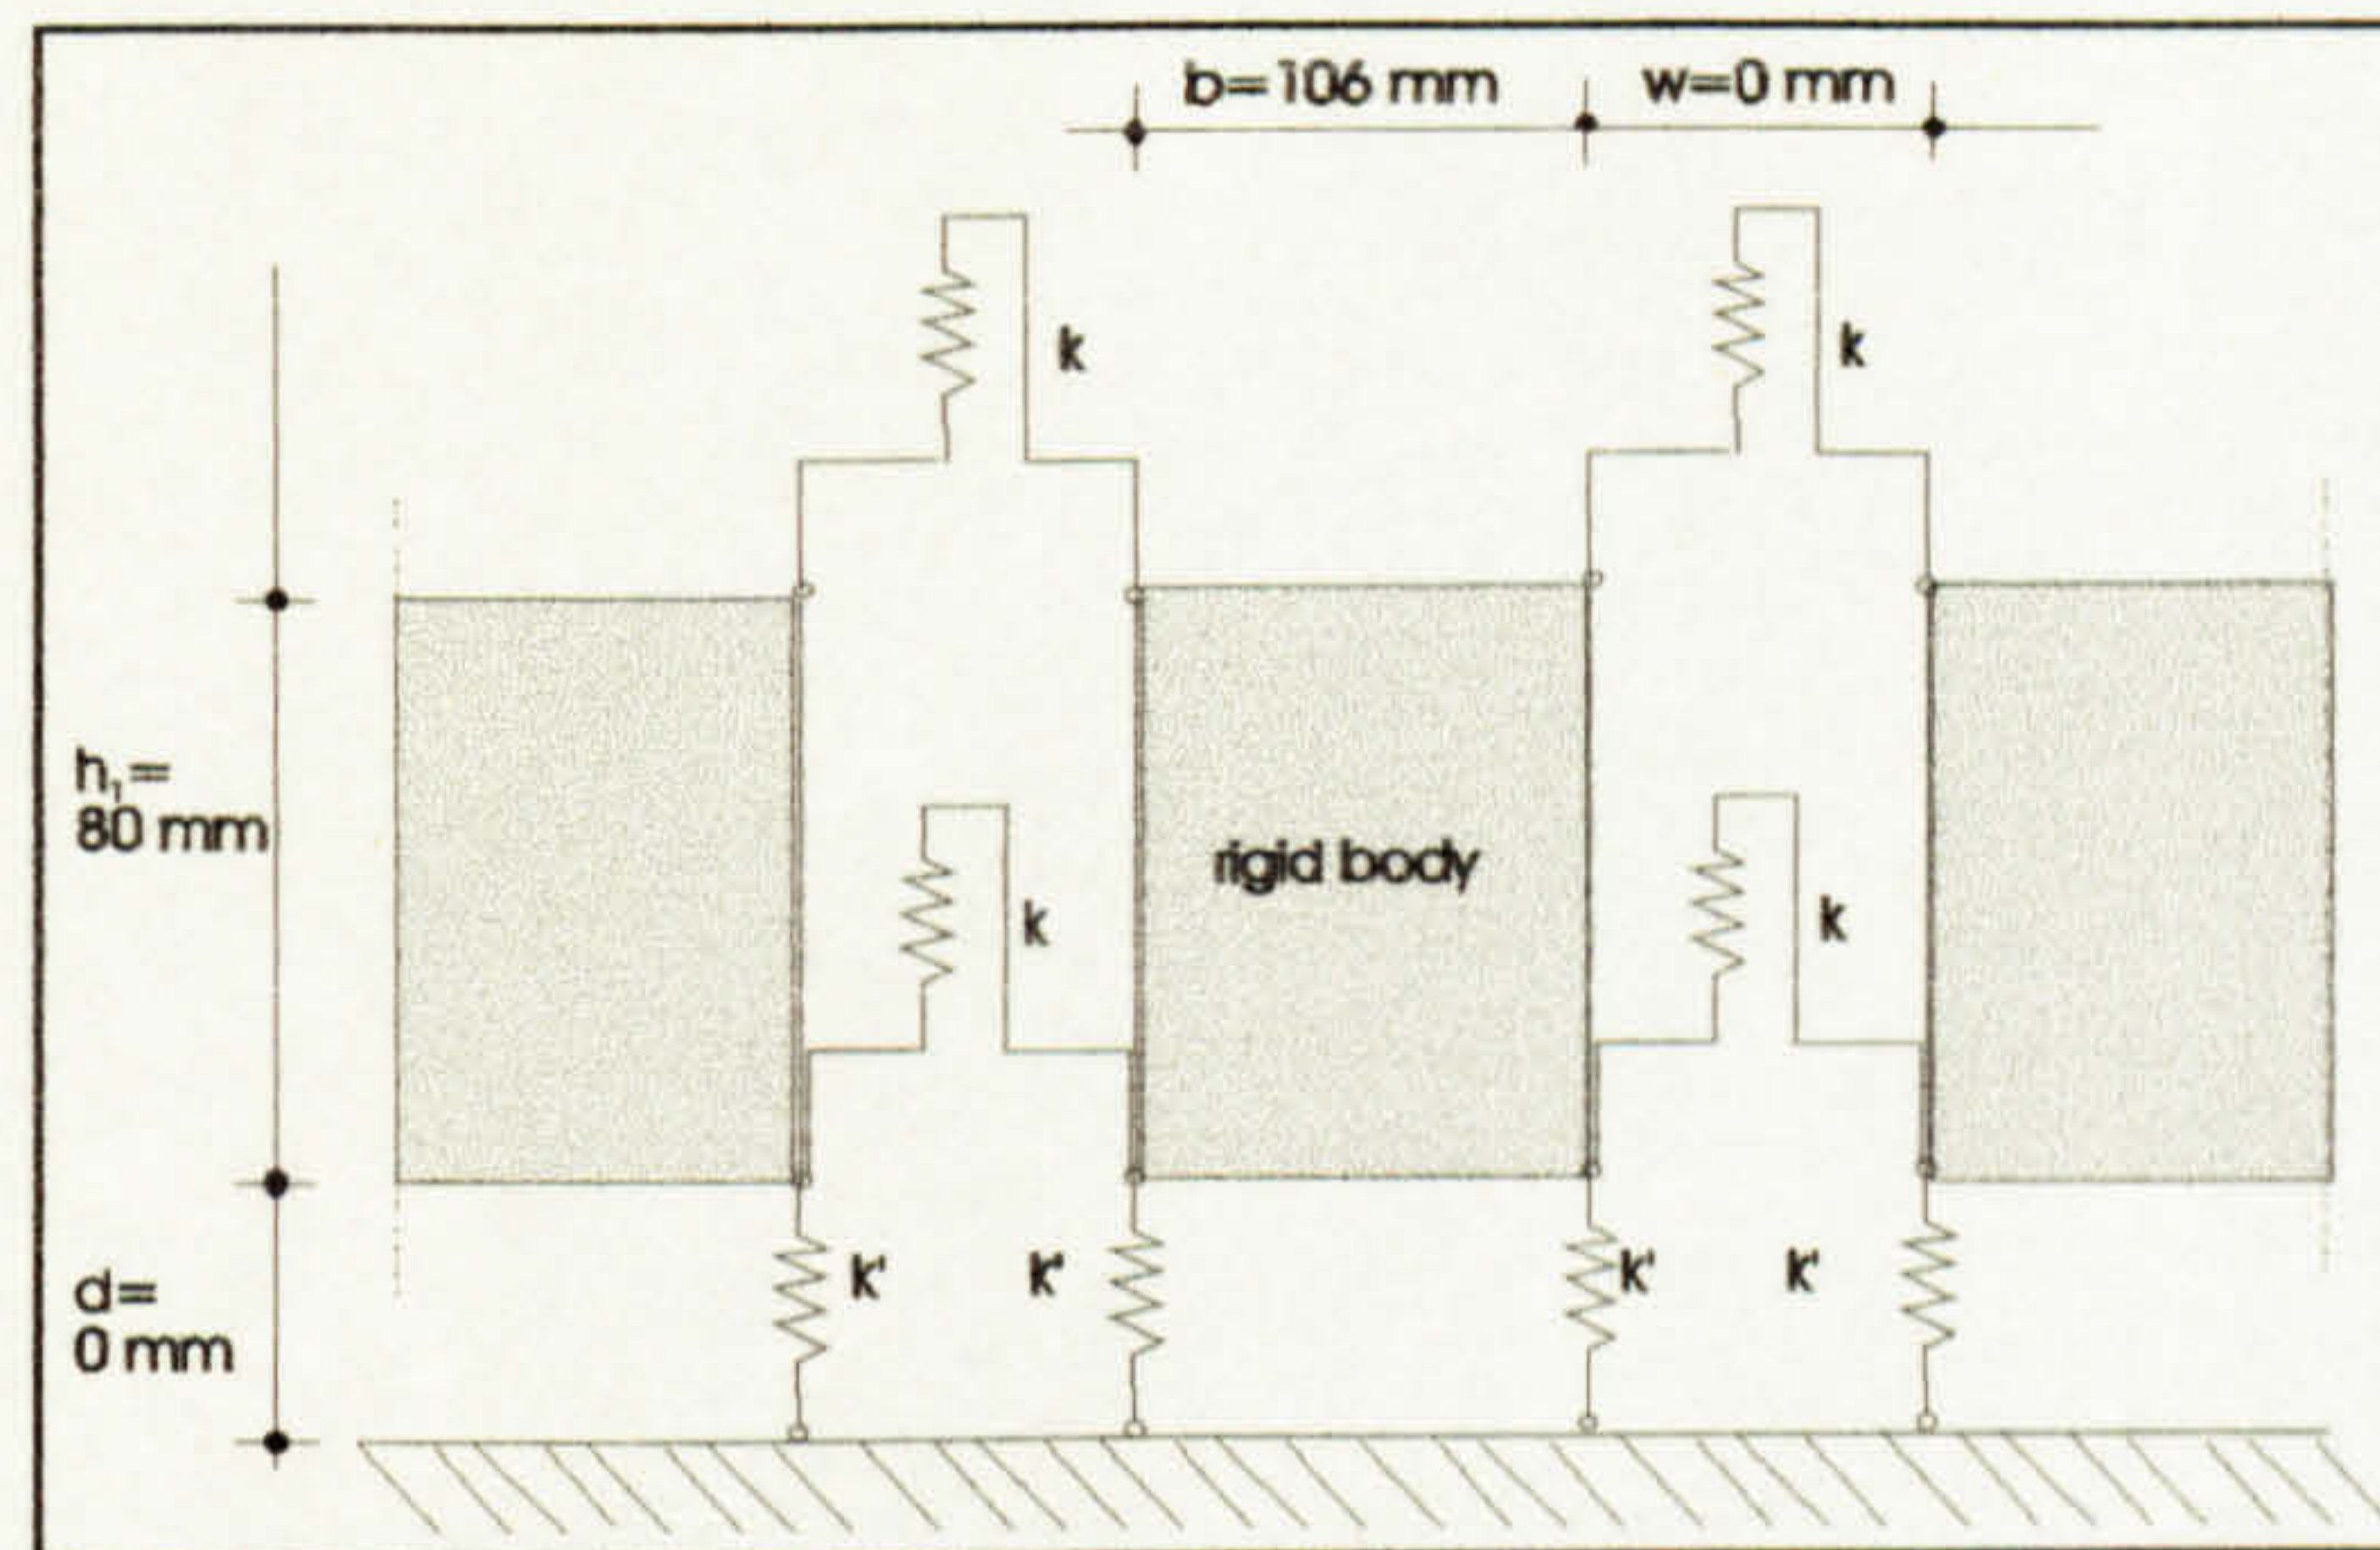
Two-dimensional finite element model is used Dutch study⁵ for concrete paver pavements.
